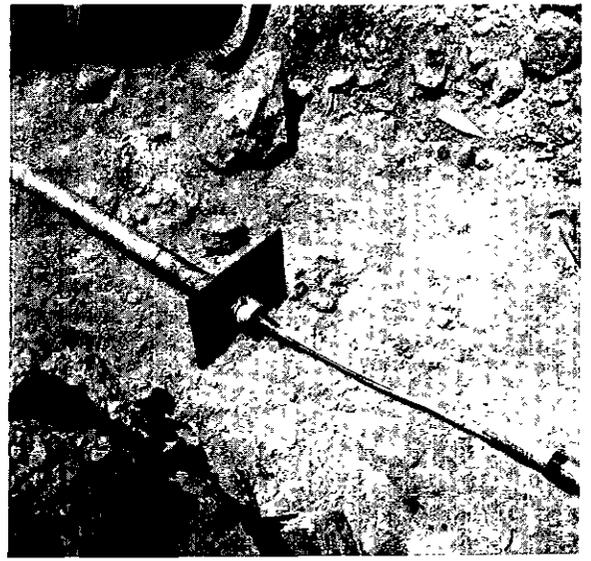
Horizontal movement platform constructed of 3/8" steel plate. Used at Station 80+00.
